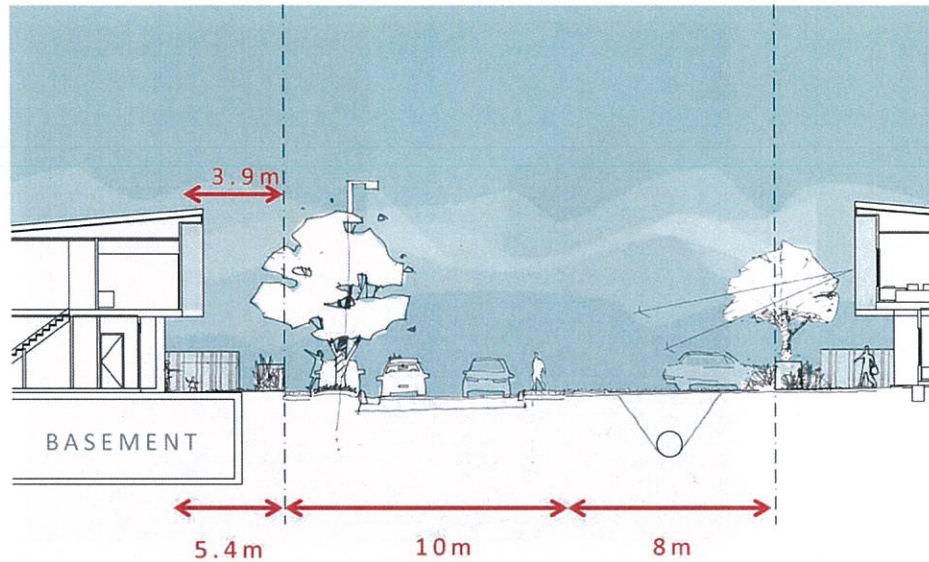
Exemplar Indicative Built Form – Lot E and Lot F Townhouses
